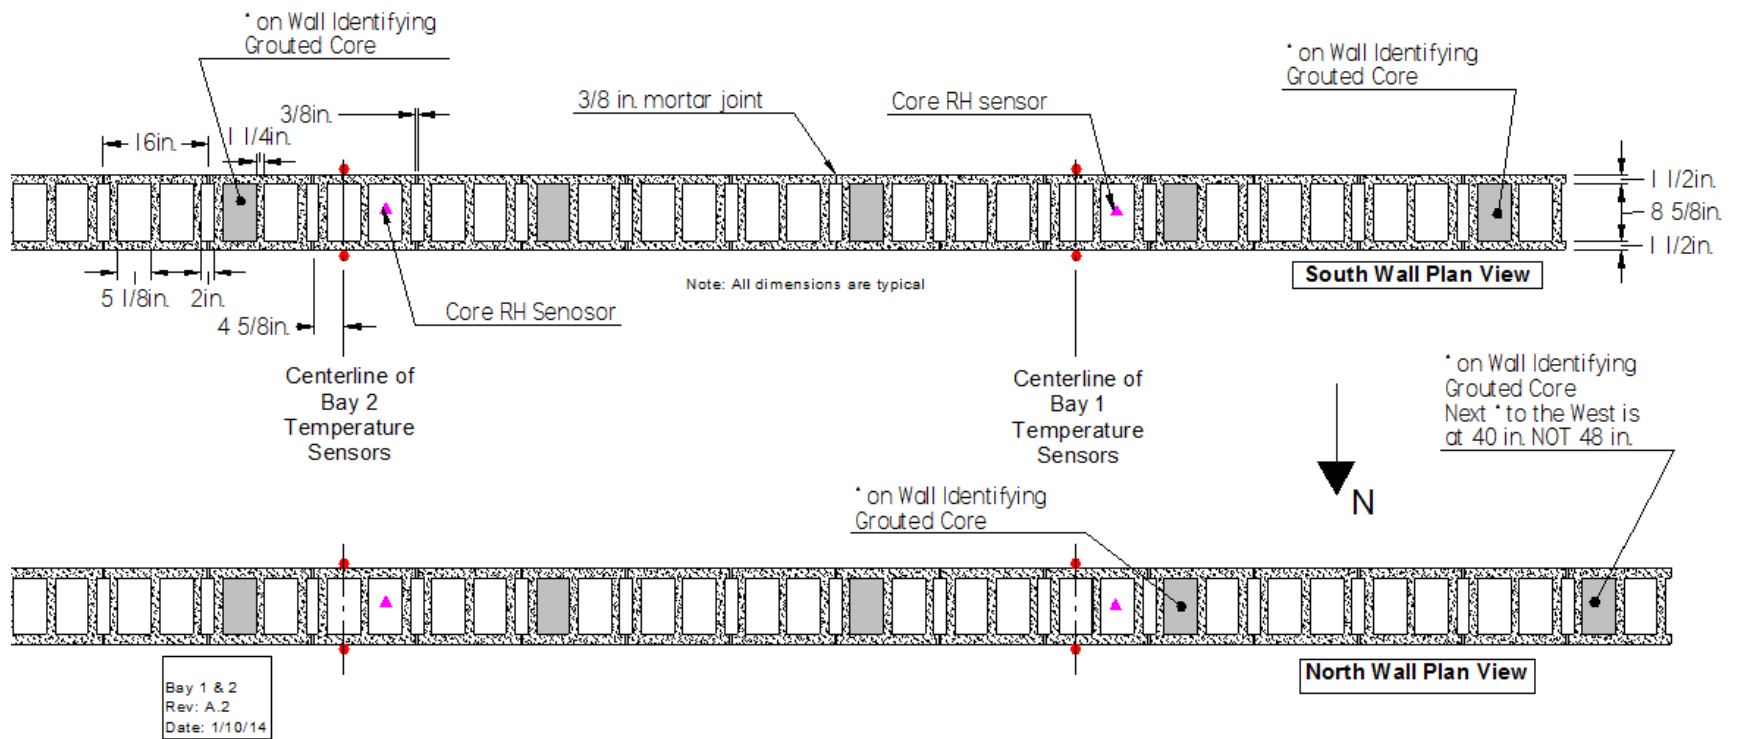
Wall Sensor Layout for Bays 1 and 2 North and South
